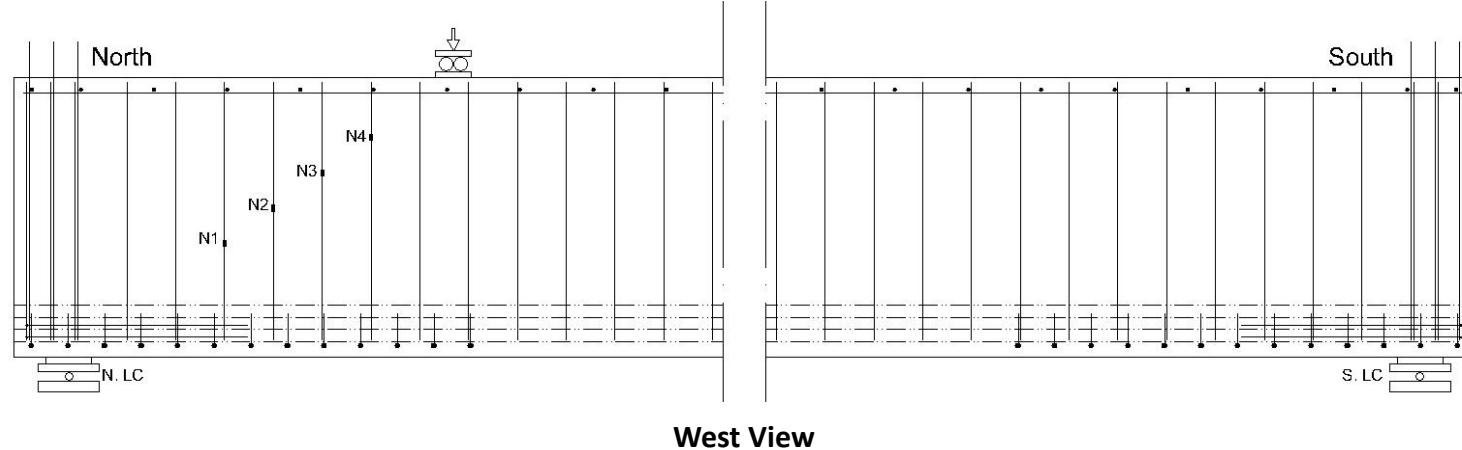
Layout of Strain Gauges on Transverse Reinforcement for Girder D2-North End Testing (Labib 2012)
